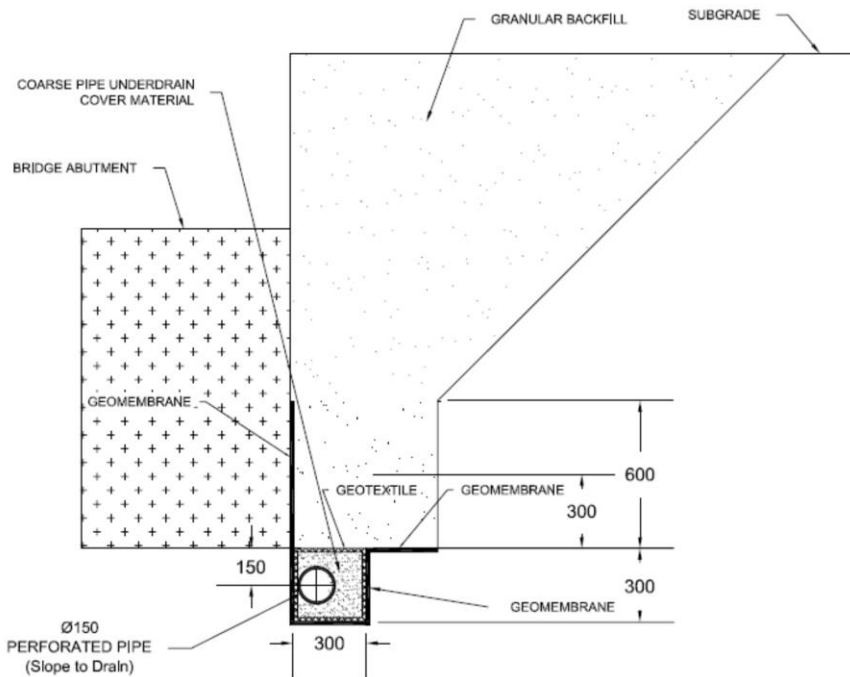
Proposed Abutment Backfill Drainage System, Depressed with Geomembrane and Geotextile Filter (units in mm: 300 mm≈12 inches) (from Miller et al. 2013)
